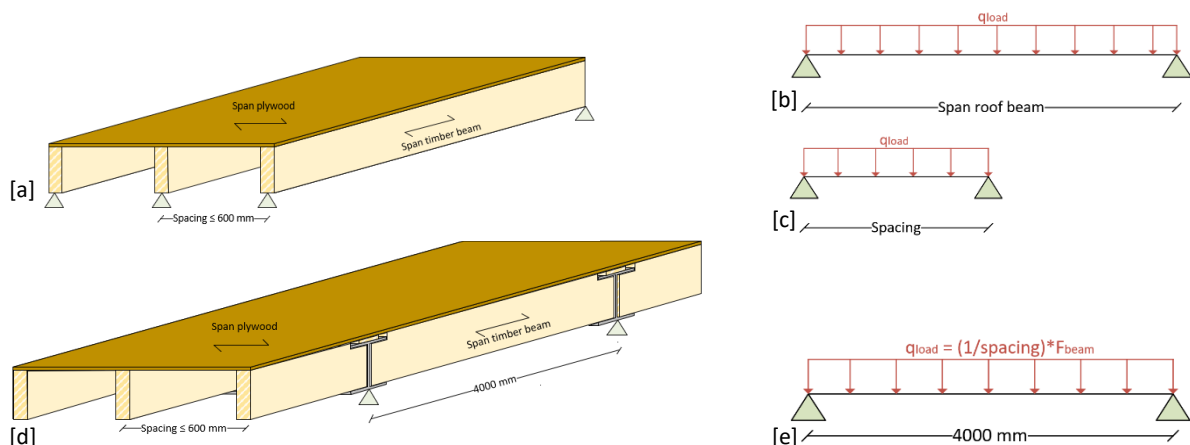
Floor structure. [a] 3D Structure; [b] Structural scheme beam; [c] Structural scheme plywood (Self-produced); [d] Structural system for spans > 5.8 m; [e] Schematization steel beam (Self-produced).
